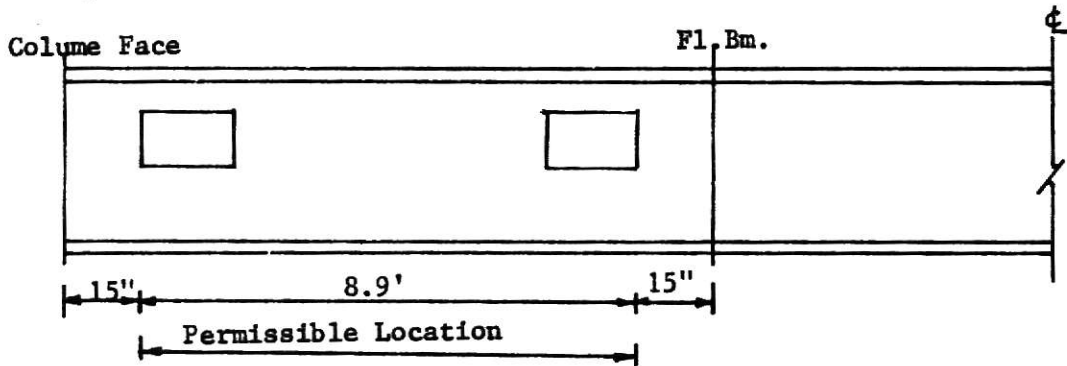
Permissible Opening Location for Girder with $A_r = 1.5$ sq. in.
